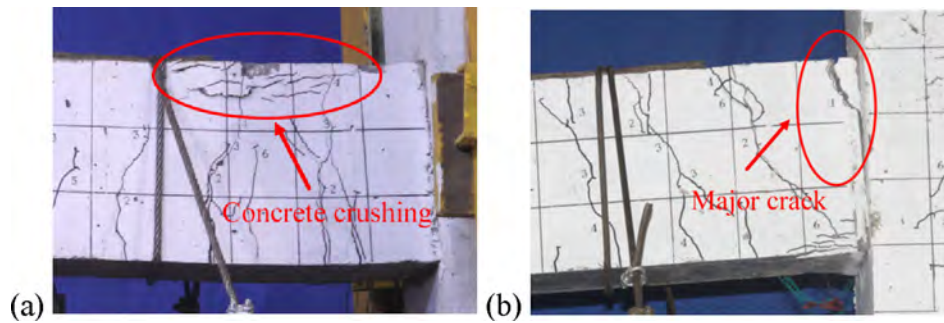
Crack distribution of RC specimen at the end of the test: (a) interior beam-column joint; (b) right exterior beam-column joint.
